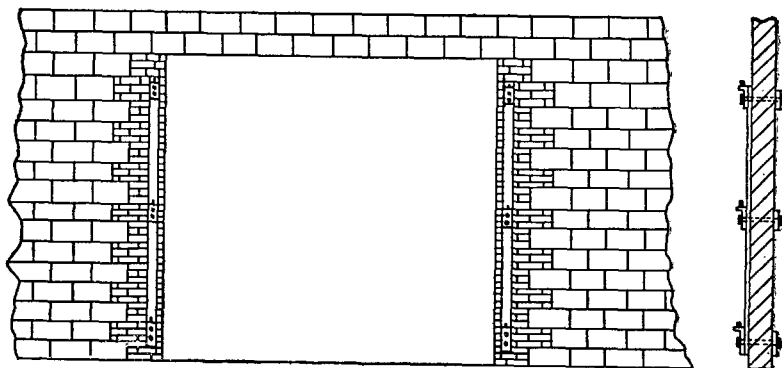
Concrete block wall prepared for doors swinging in pairs — lap mounted, standard method.
